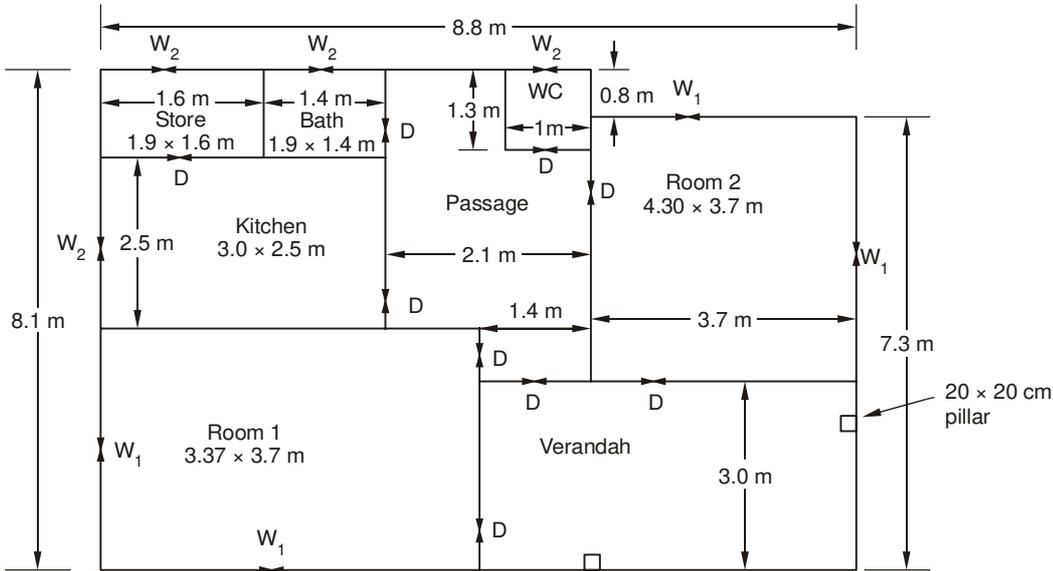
Centre-line Plan of a Building (Not to Scale)
